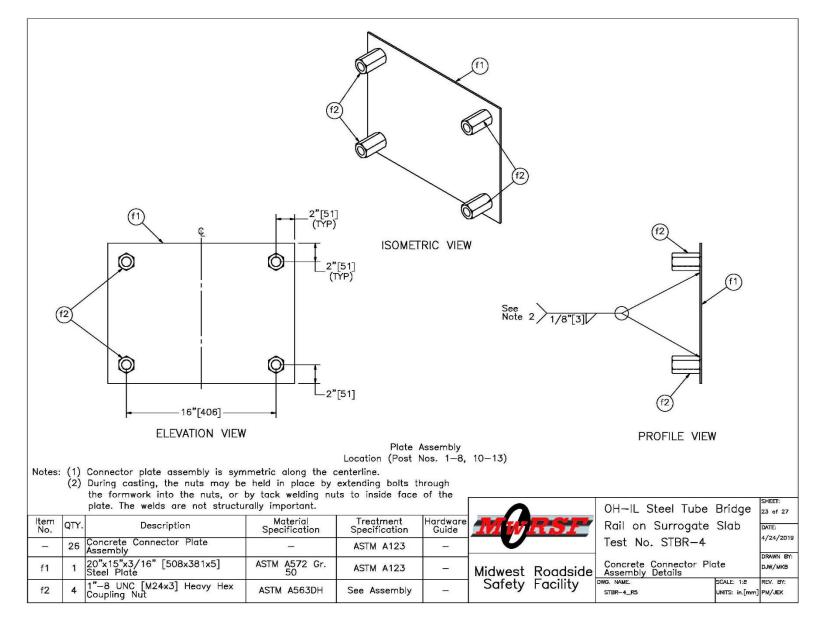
Concrete Connector Plate Assembly Details, Test No. STBR-4
